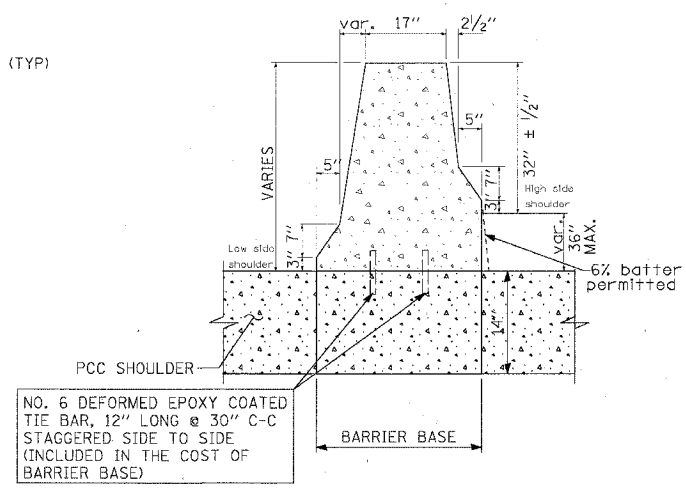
DETAIL OF "CONCRETE BARRIER TRANSITION" FOR DOUBLE FACE BARRIER WALL
